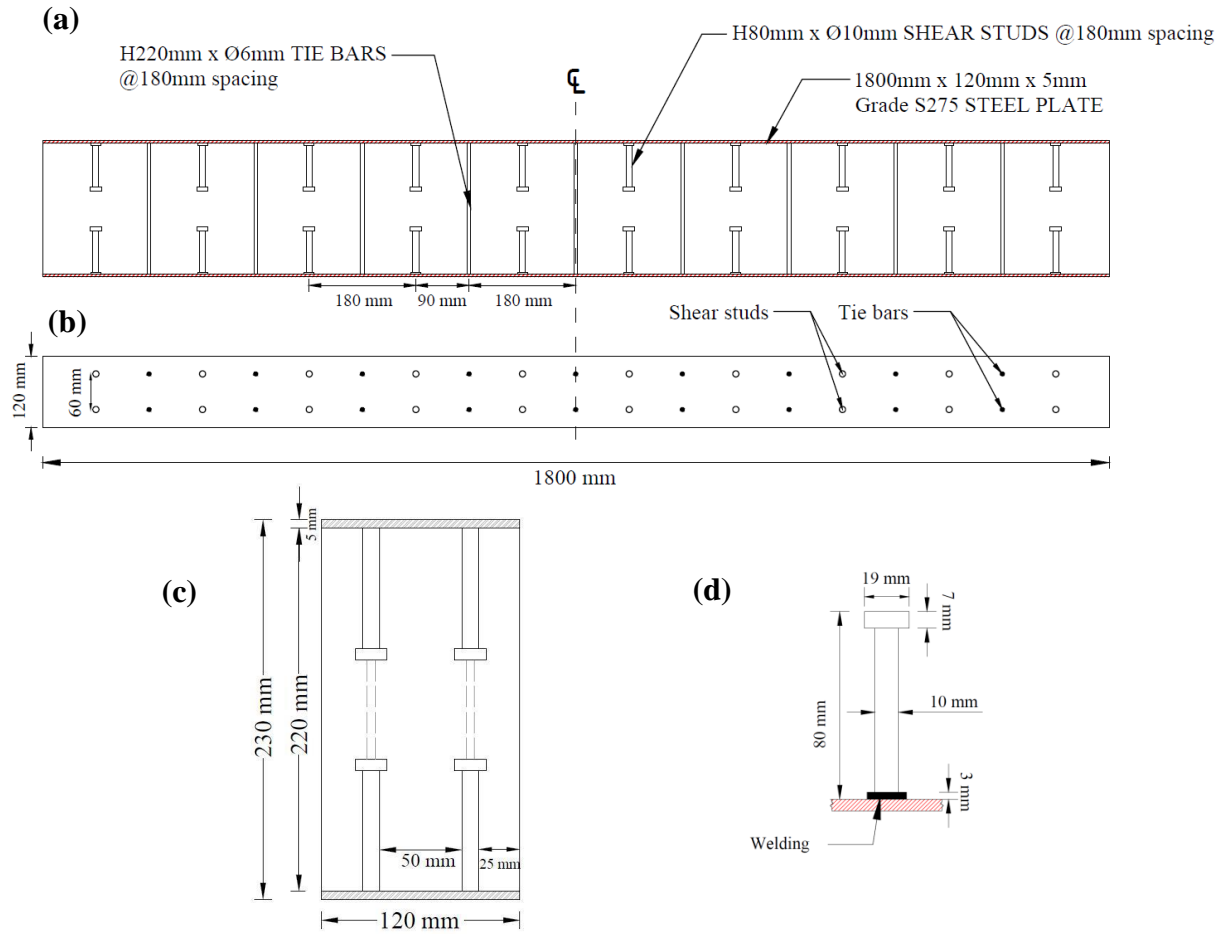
SC beam dimensions: (a) SC beam elevation; (b) shear stud and tie bar layout on both steel plates; (c) SC beam section; (d) shear stud details
